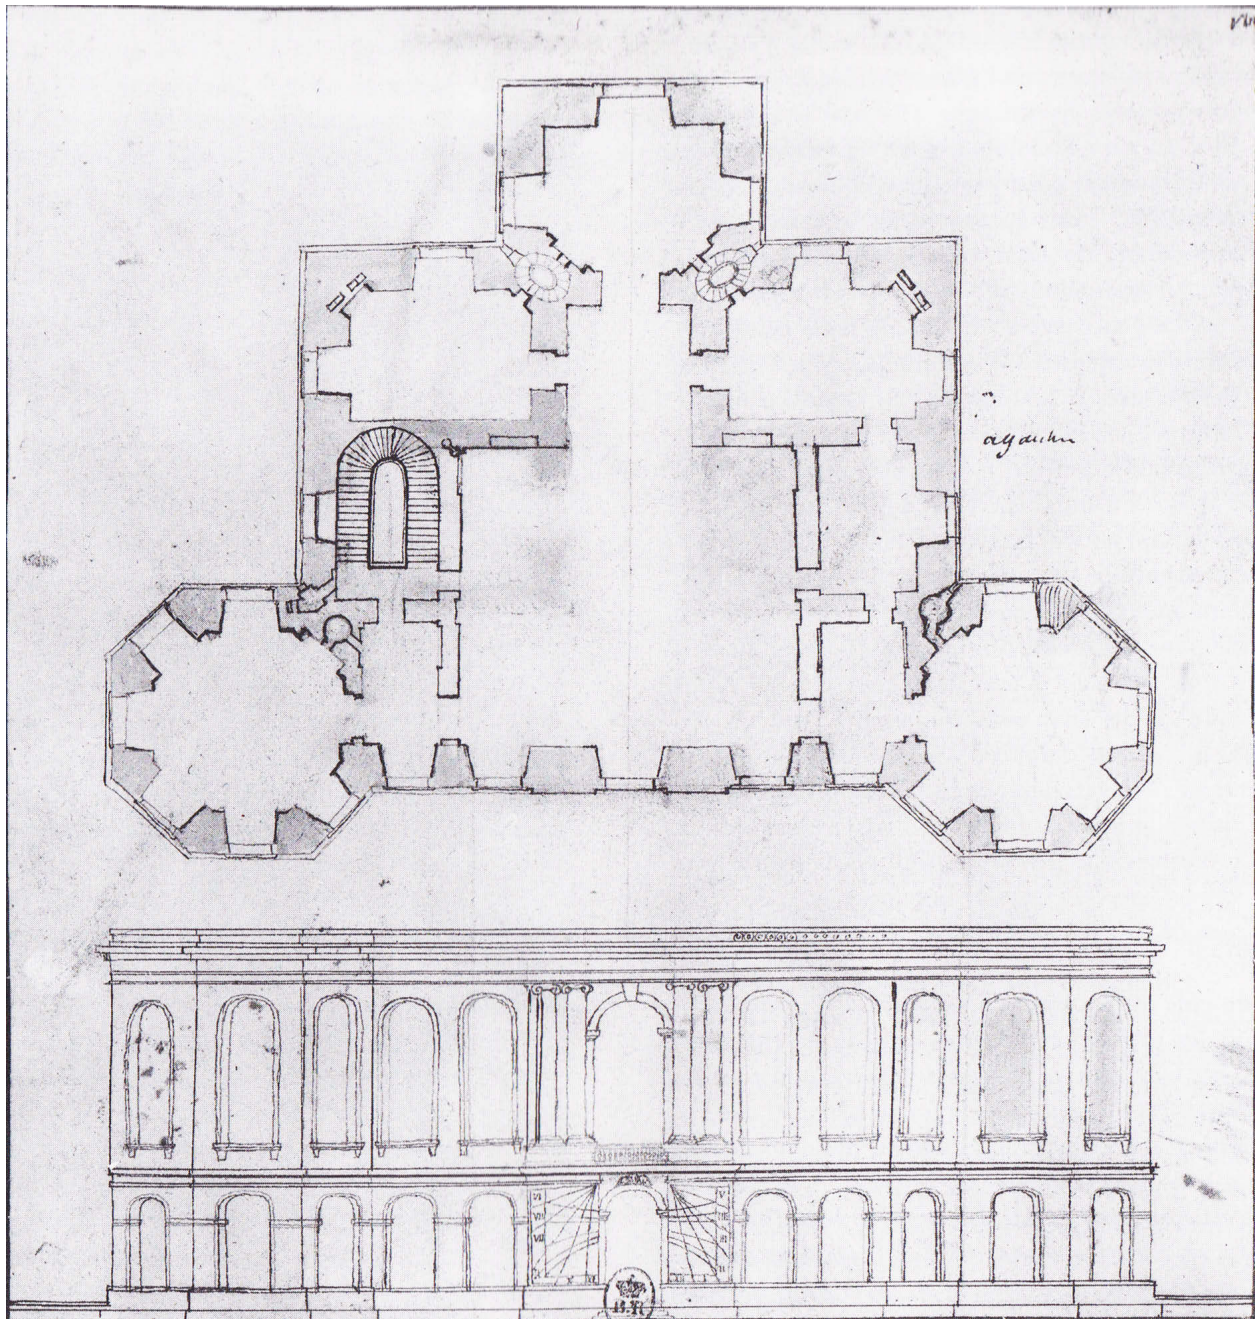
Draftsman unknown. Plan and south elevation of the Observatory showing the revised top floor plan. Note that the walls of the original plan can be seen though the erasure. Courtesy of the Bibliothèque nationale de France.
